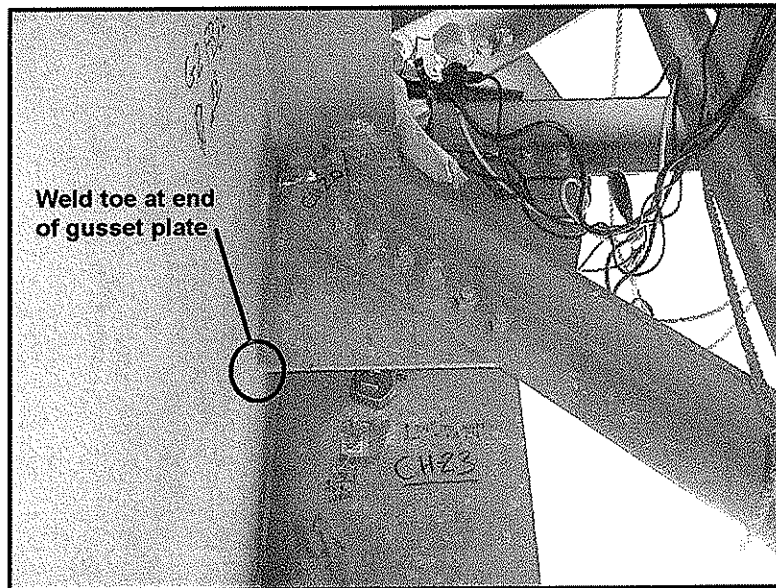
Photograph of longitudinal weld termination at “free” end of gusset plate
